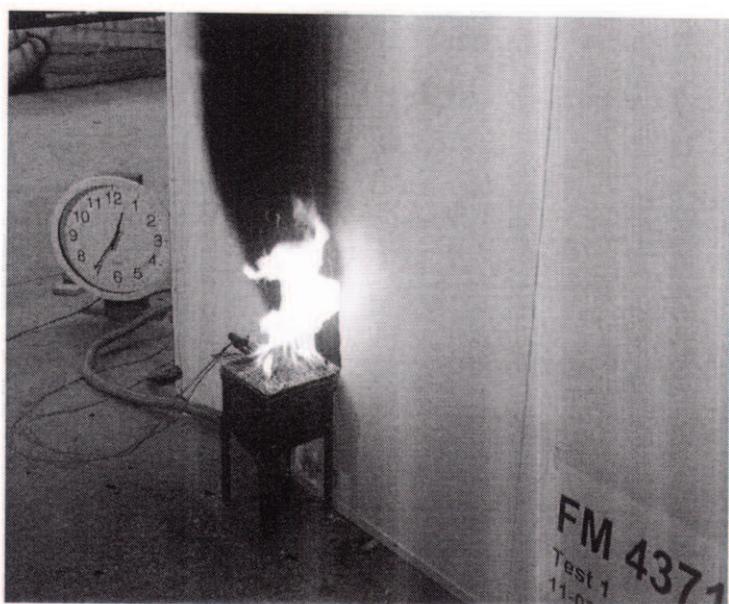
Wall test 1 – after 36 minutes (burner at 40 kW)
